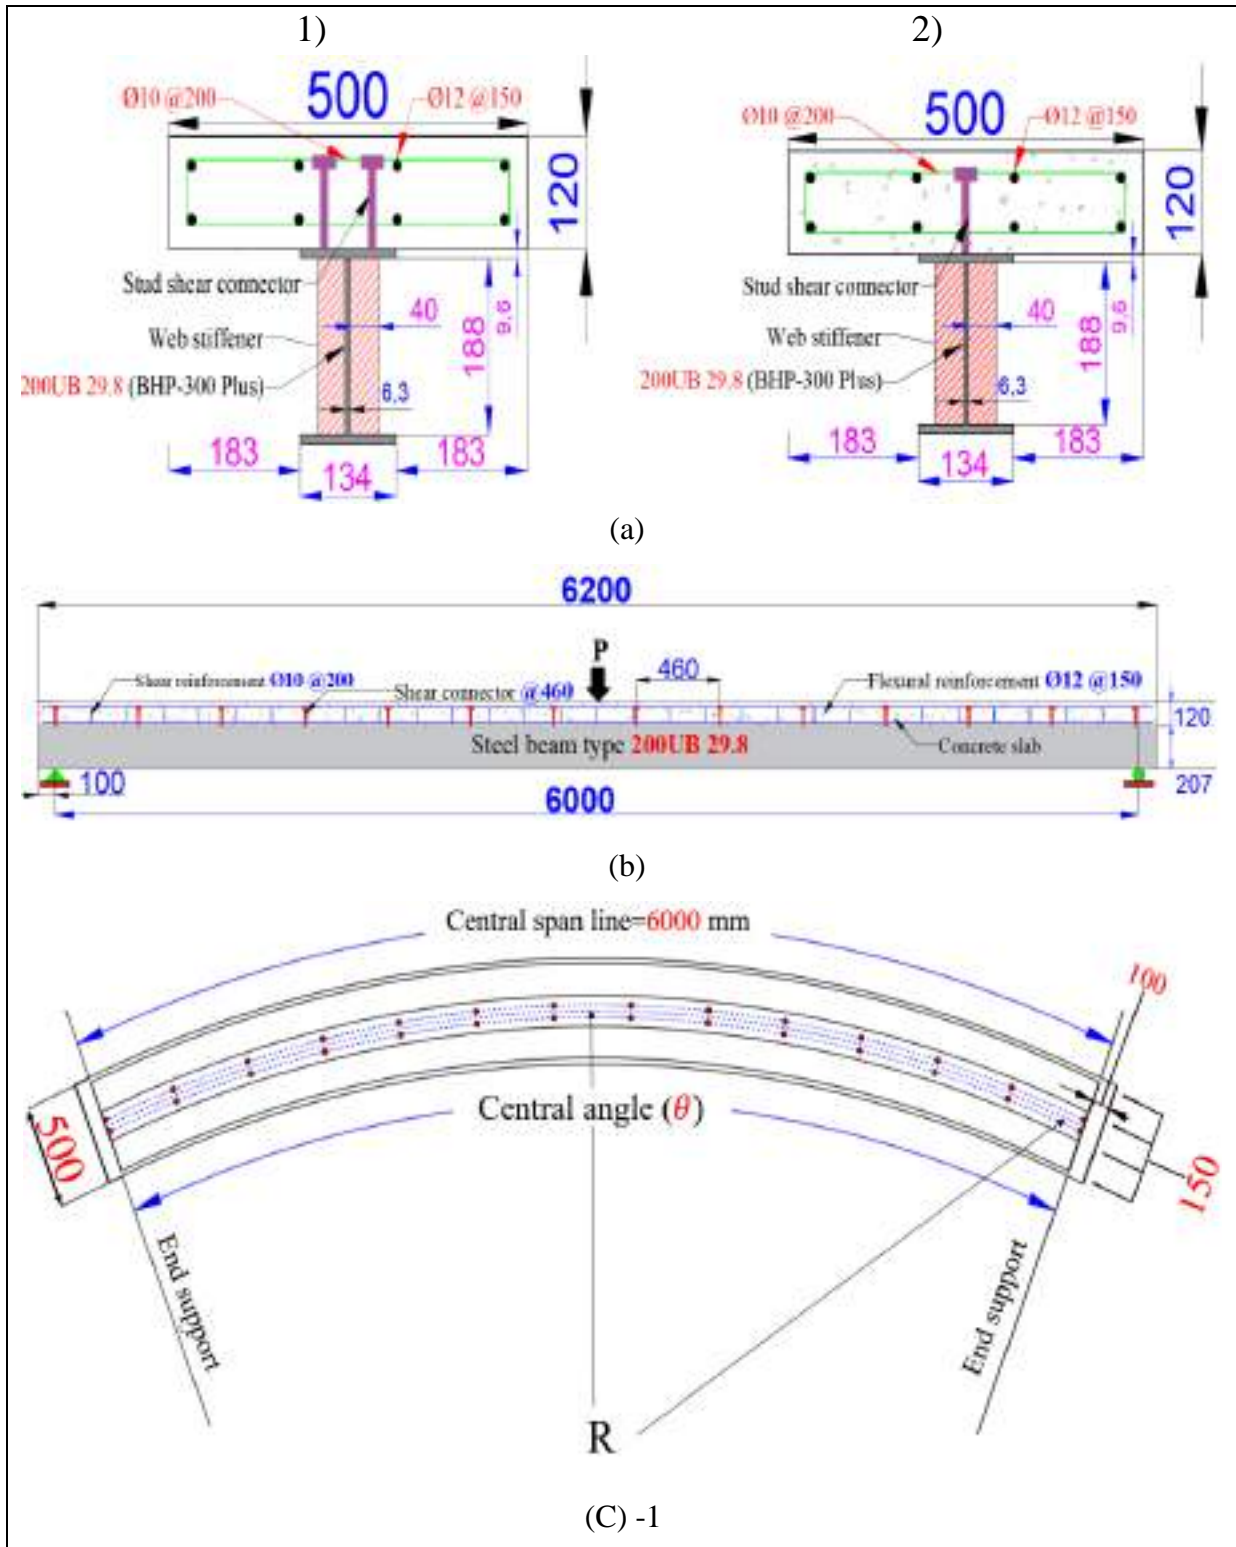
Geometry and dimensions of the curved composite steel-concrete beam (unit: mm): (a) Cross section for: 1-CCBF; 2-CCBP, b) Side view, (c) Plan for 1- CCBF; 2- CCBP.
